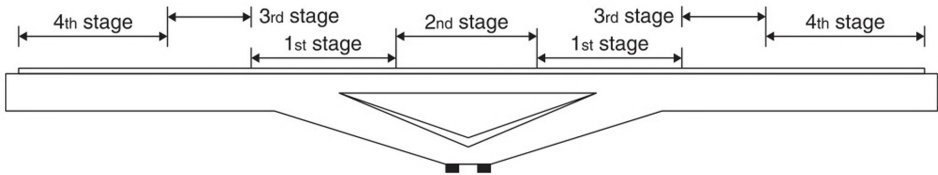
Casting order of the bridge deck with prestressing after the first three stages.
